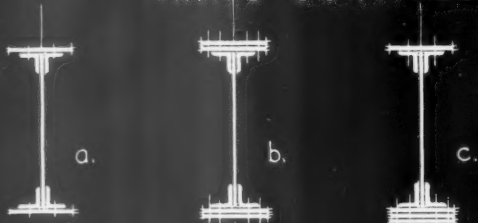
Typical unsymmetrical plate girder sections for corners of frames
